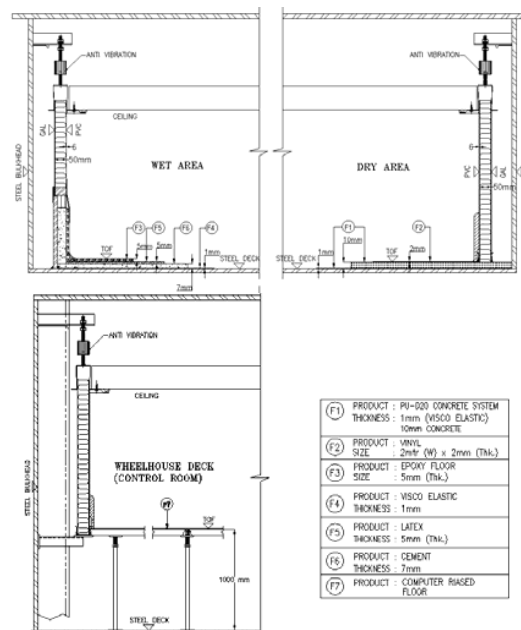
Typical construction of deck covering system for dry areas, wet areas, and control rooms
